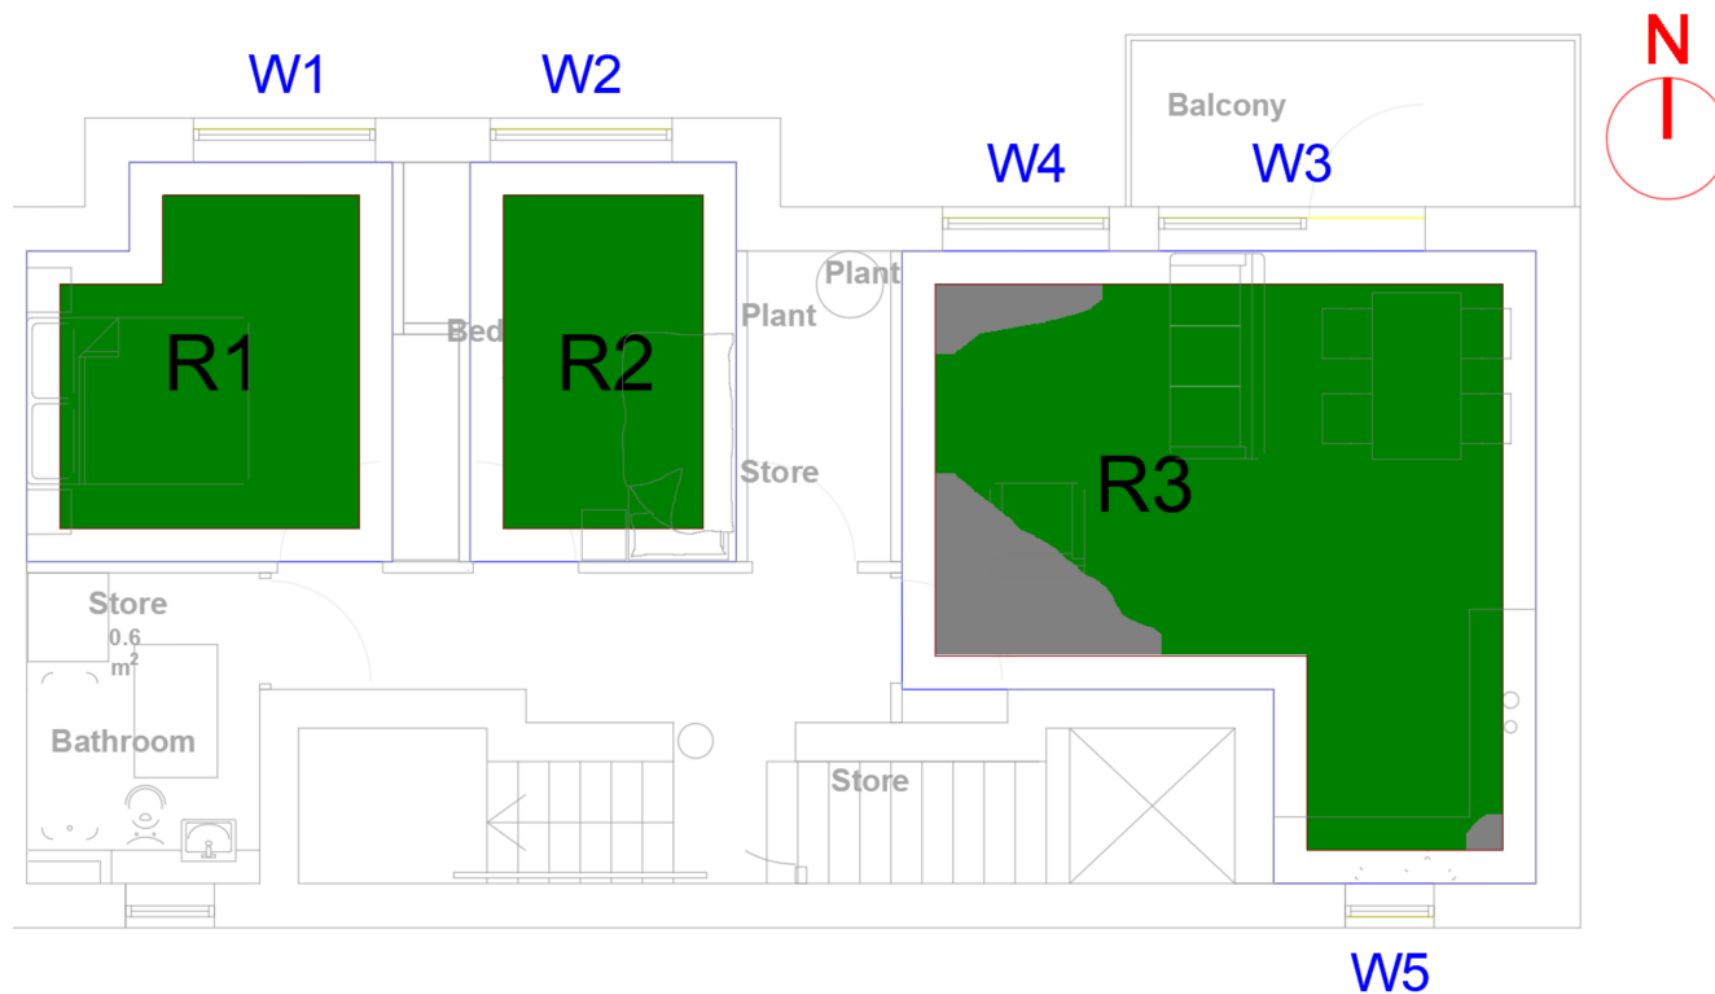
Proposed Ground Floor sDA Contours of House No.2 Block C (Duplex)
